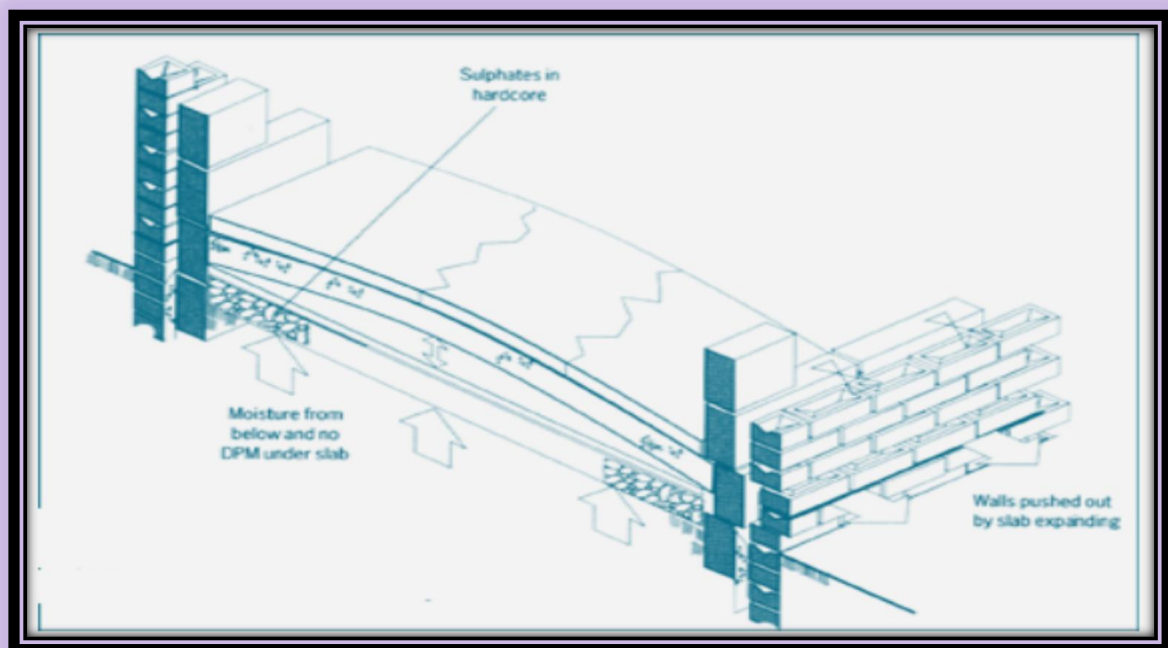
Cracking and up heaving of a tile floor due to Sulphate Action in base
